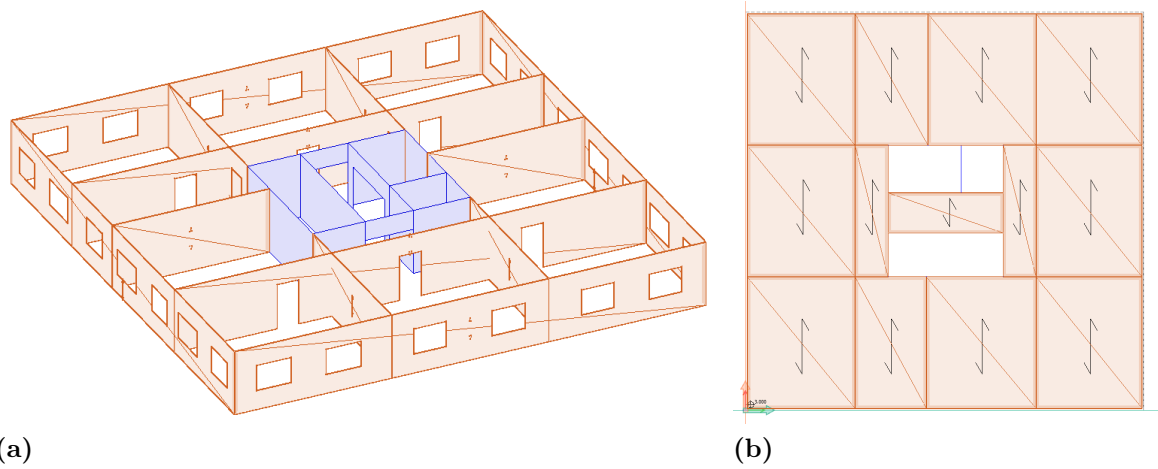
(a) One storey of the FE model. The blue walls are core walls. The orange walls are the surrounding CLT shear walls. (b) The main direction of CLT floors
